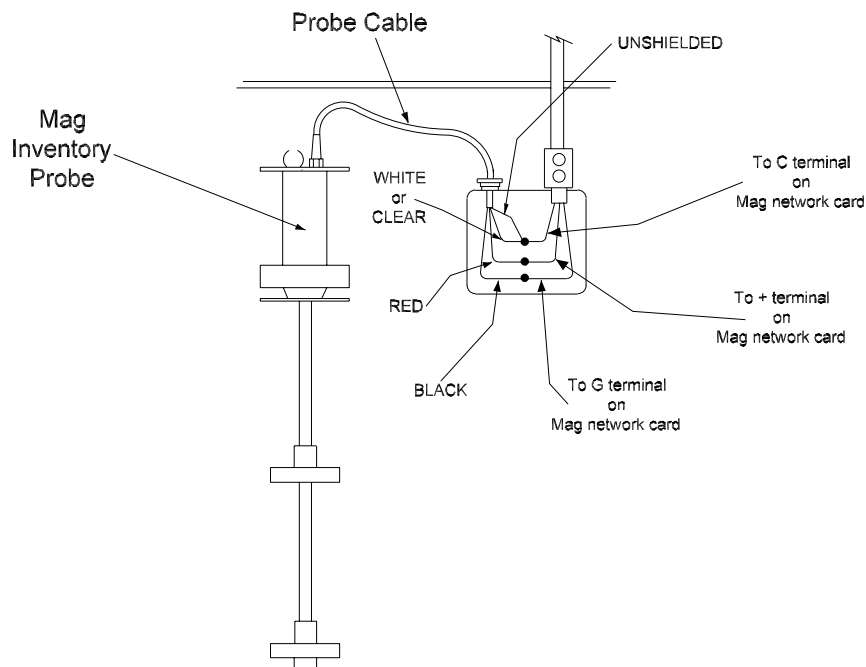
Mag inventory probe to cable connections, conduit installation
